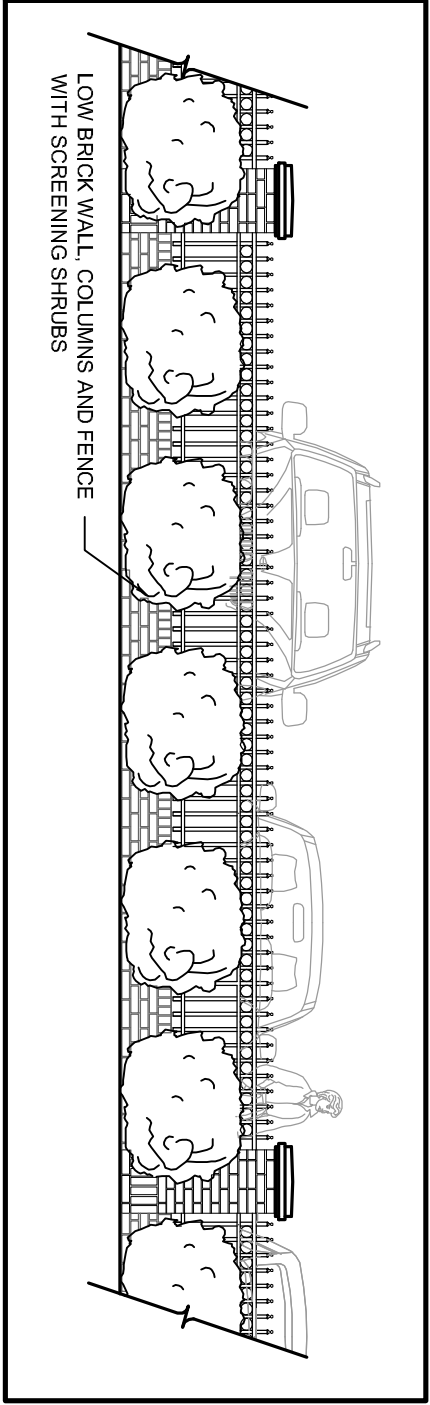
EXHIBIT B: W.T. HARRIS BLVD PROPOSED PARKING LOT SCREENING - ELEVATION
